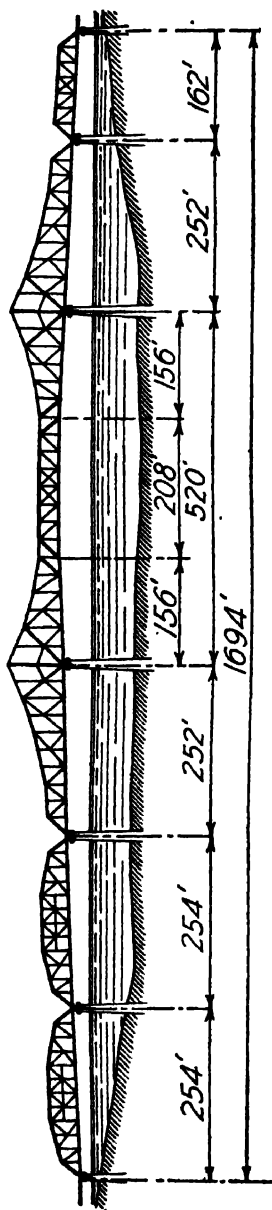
b. Cincinnati and Newport Highway Bridge over the Ohio River.
